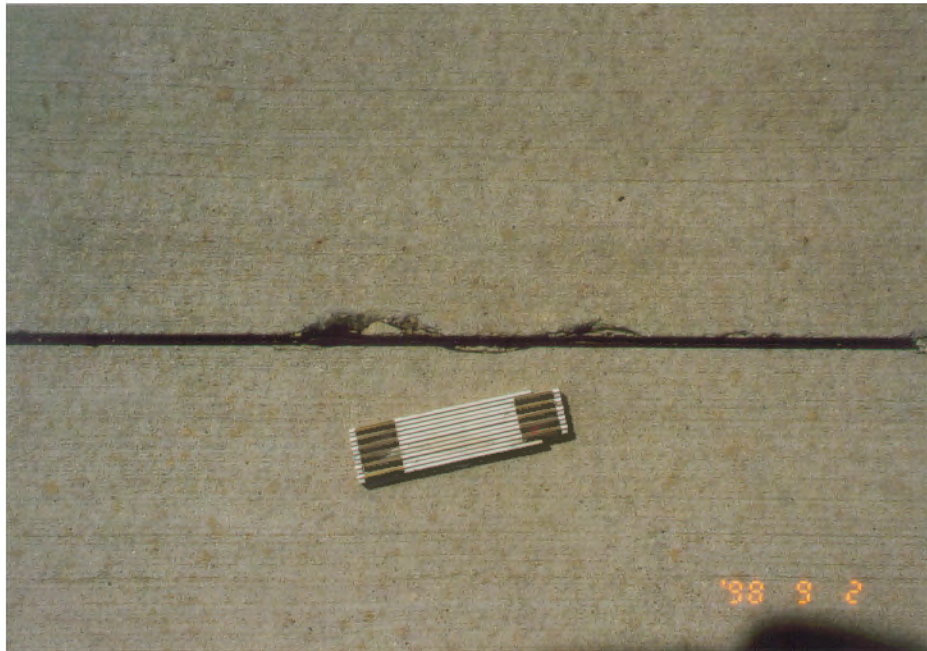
JOINT SPALLING IN CONVENTIONAL PAVEMENT (SEPT. 1998)
